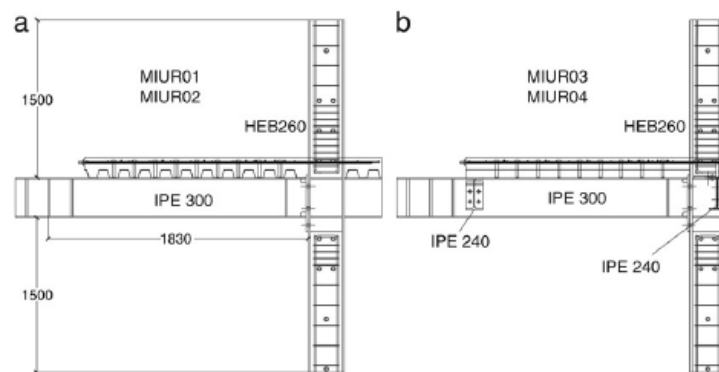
Exterior composite beam-to-column sub-assemblages tested in the laboratory [52]
